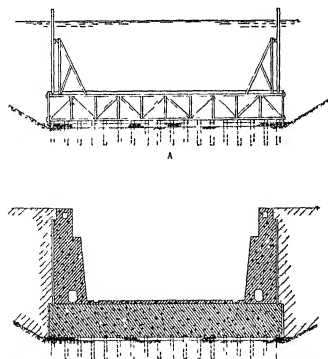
ORIGINAL TREMIE METHOD DEVELOPED BY FREDERIC R. HARRIS TO BUILD GRAVING DOCKS. A TREMIE CONCRETE FORMS. B FINISHED CONCRETE DOCK.
